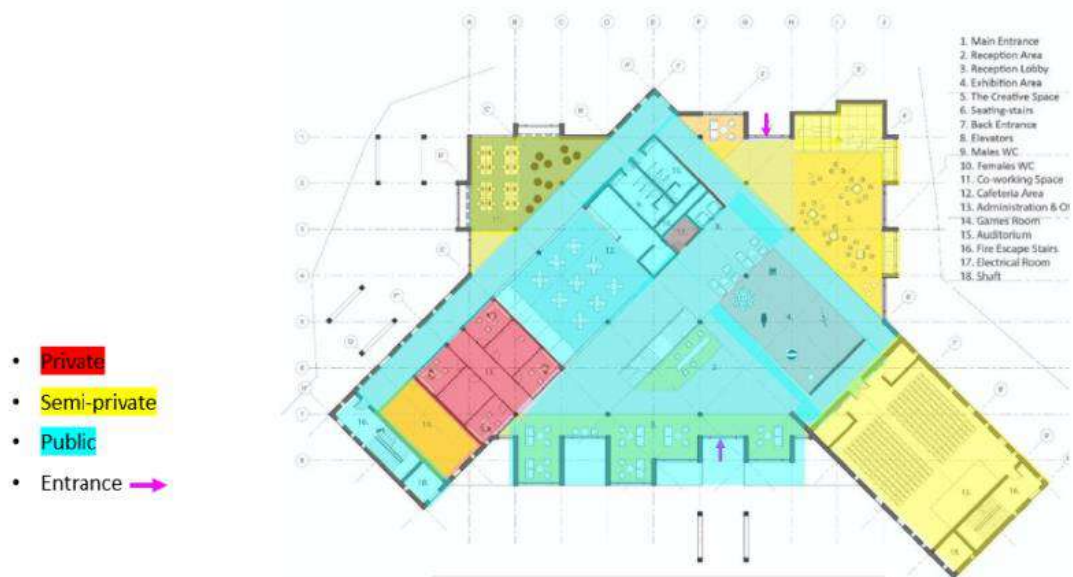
Zoning in Ground floor plan - Amman Youth Hub
